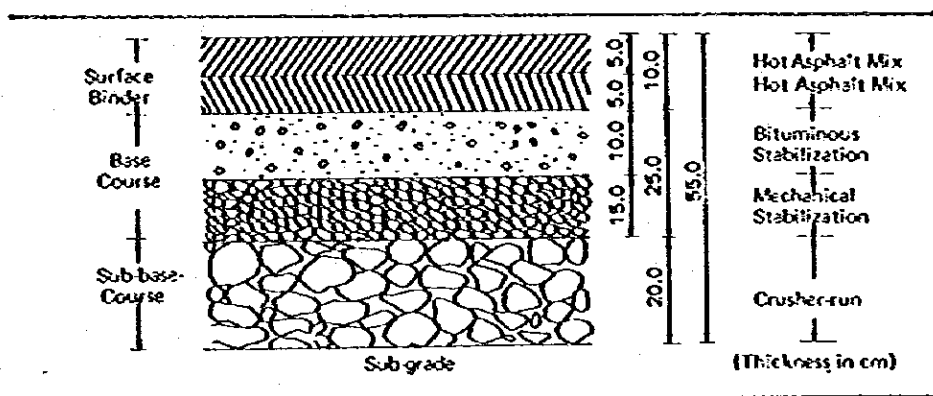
CROSS-SECTION OF PAVEMENT
